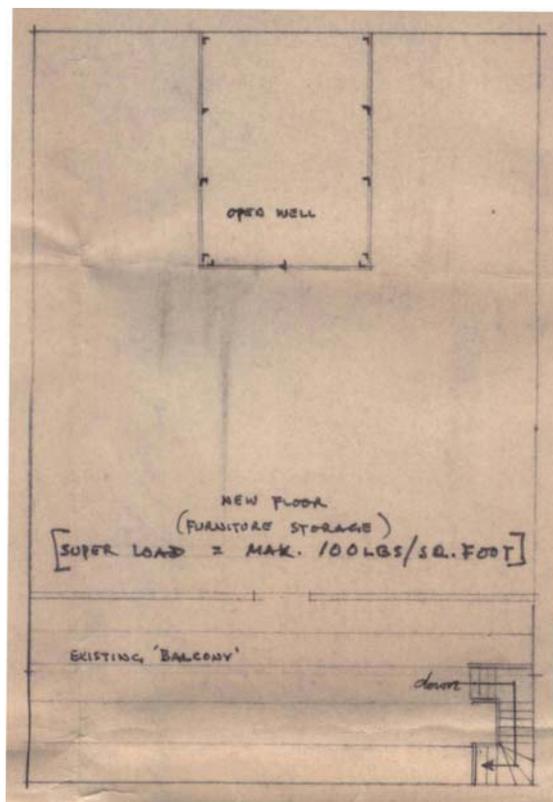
Proposed plan for a new first floor from a planning application of 1977 (Oxley 1977)
